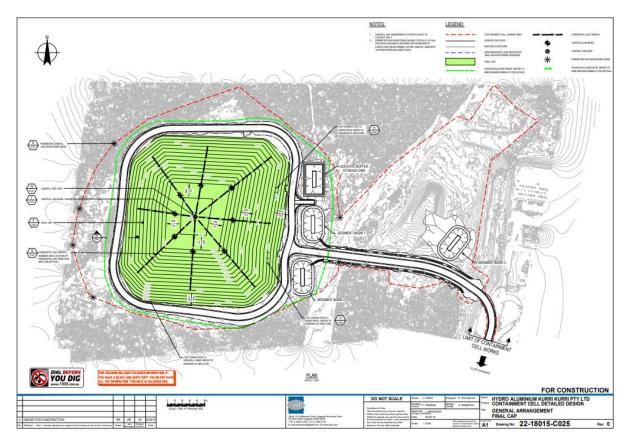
Plan showing the gas collection infrastructure in the cap (GHD, 2018)
